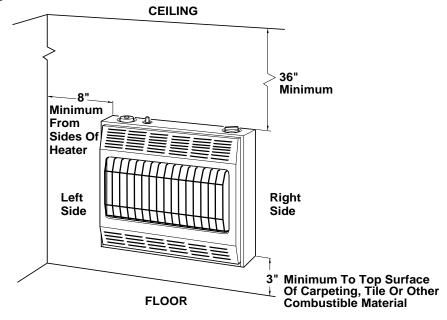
Mounting Clearances As Viewed From Front of Heater
